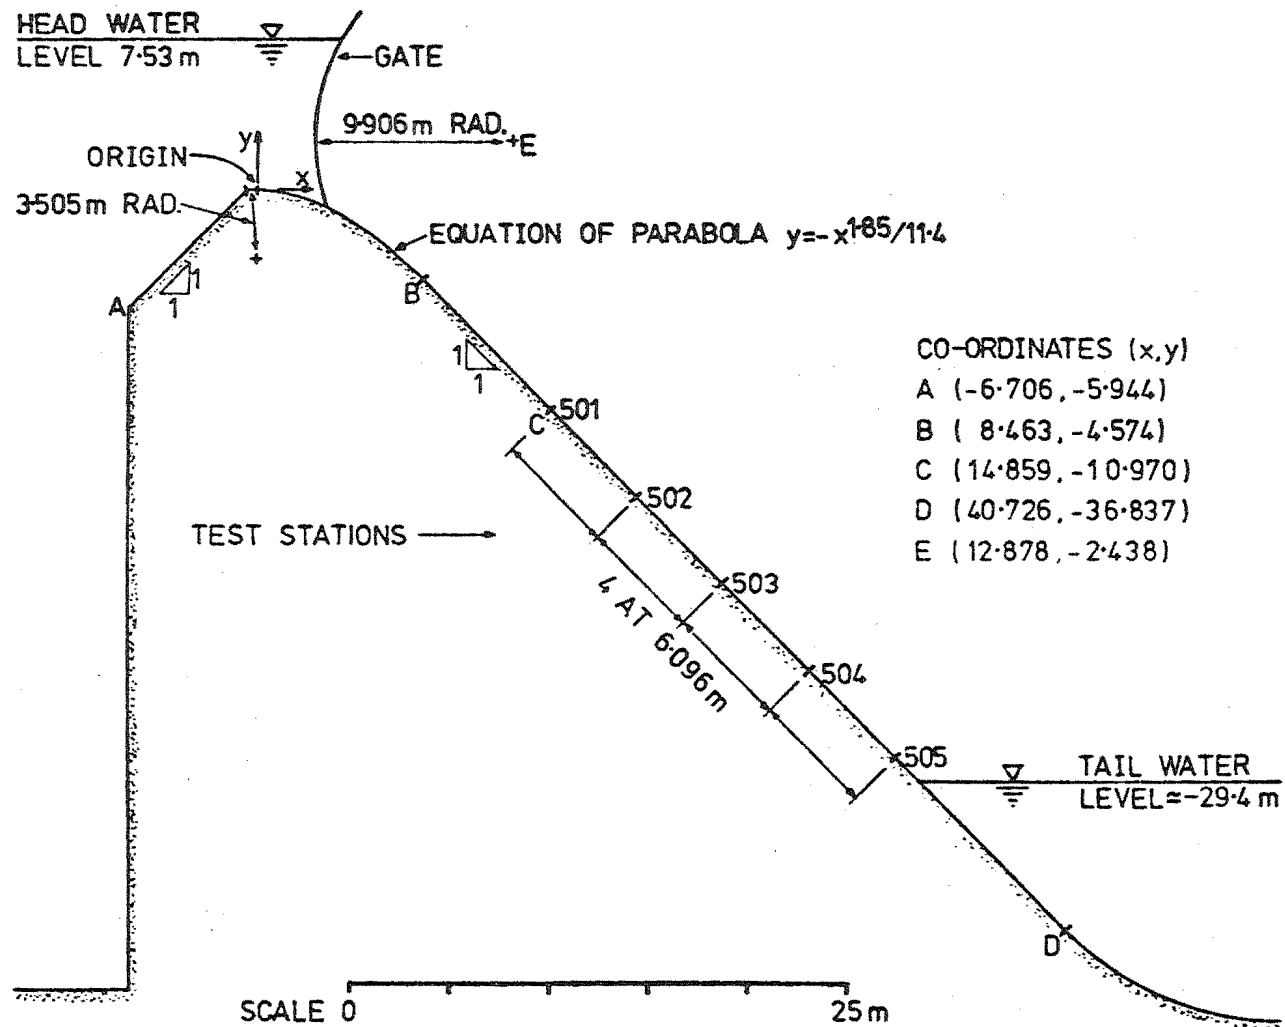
Dimension Sketch of Spillway and Test Stations.
